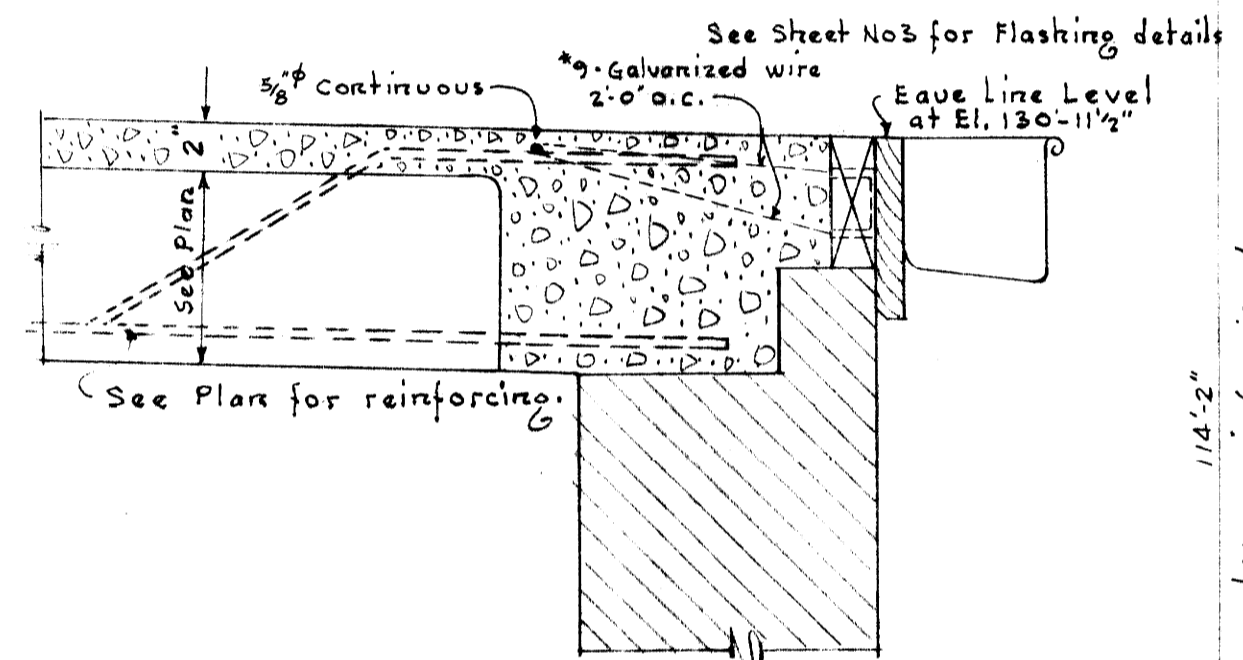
DETAIL OF CORNER OF PRESENT BUILDING AT FRONT WALL
